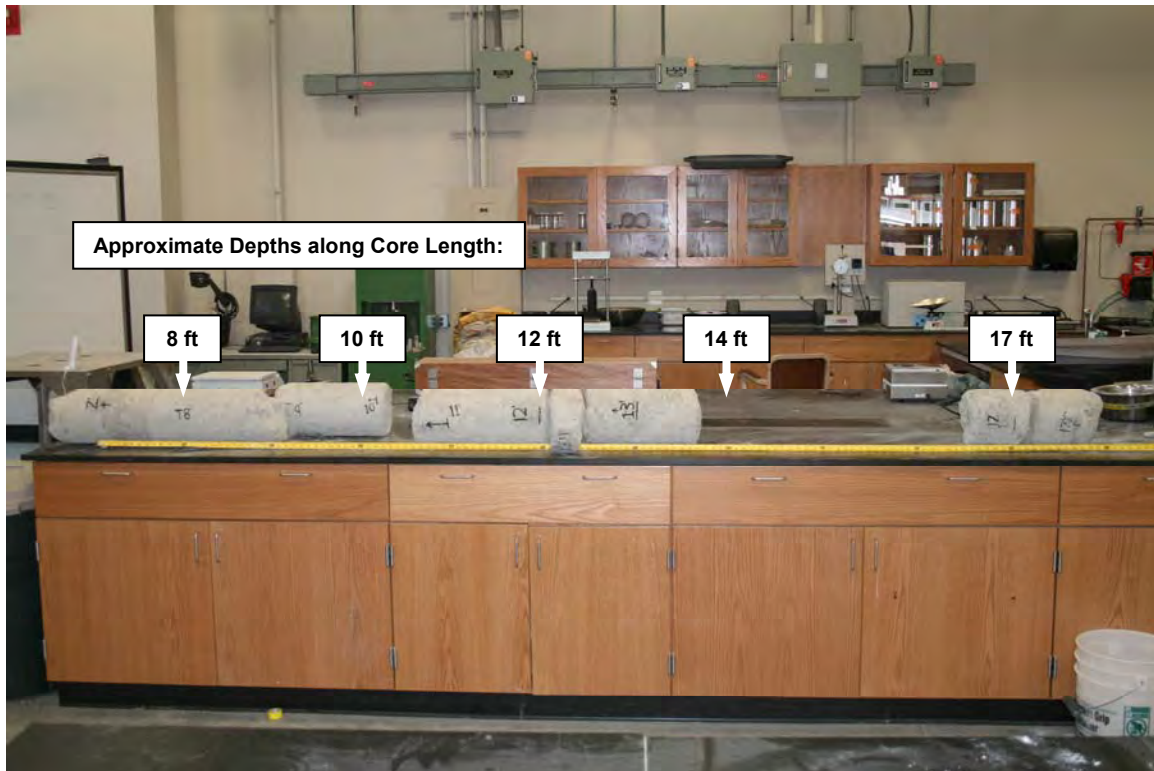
Photograph of a Concrete Core Retrieved from Drilled Shaft #3 at the Jacklin Road Undercrossing
